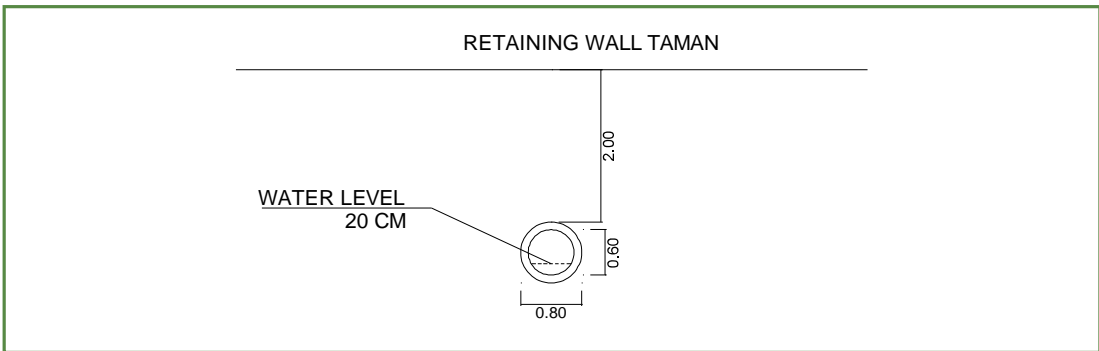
DETAIL OF CULVERT - 1 (TAMBORA AREA-2)
